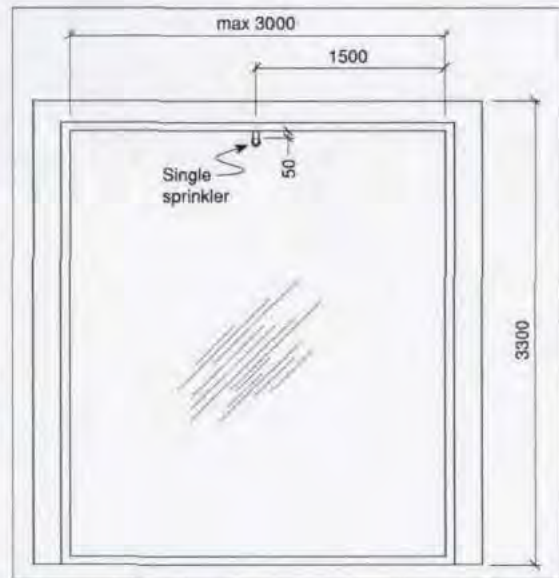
Location of single sprinkler for protection for full-height window assembly (elevation)
